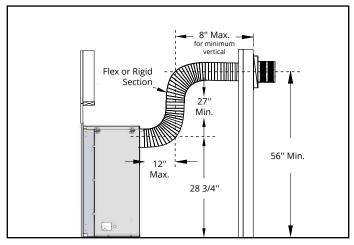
c 5"/10" Rear Vented, wall mounted Multi-elbow termination installation. The vent run must comply with the Venting Graph for Rear vent, wall mounted terminations
